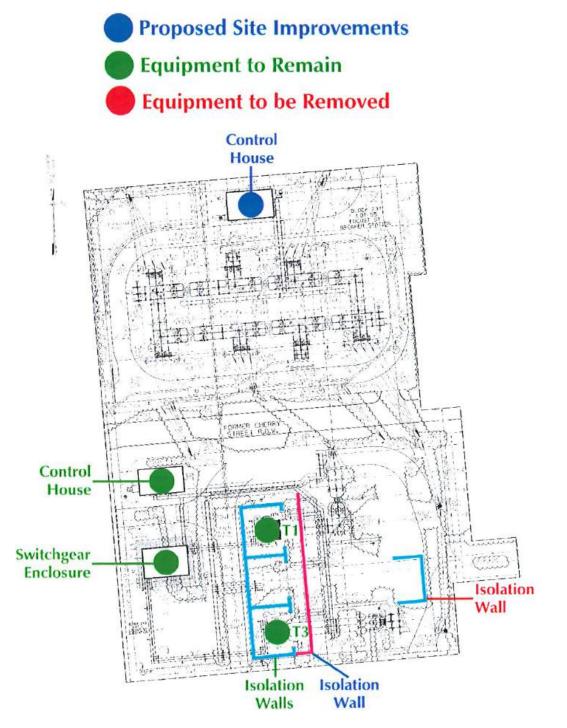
PSE&G Locust Street Substation, Camden, NJ showing major equipment and systems to be added in blue, equipment to be removed in red, and equipment to remain in green. Existing isolation walls shown in light blue; future isolation wall shown in pink.
